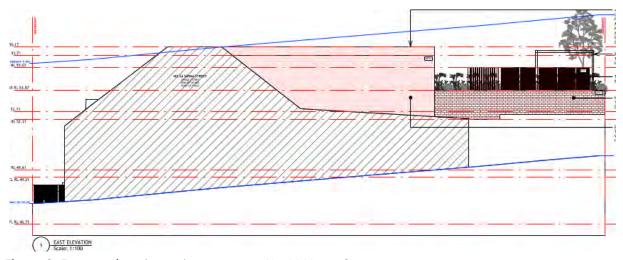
Eastern elevation as it presents to No.44 Varna Street
